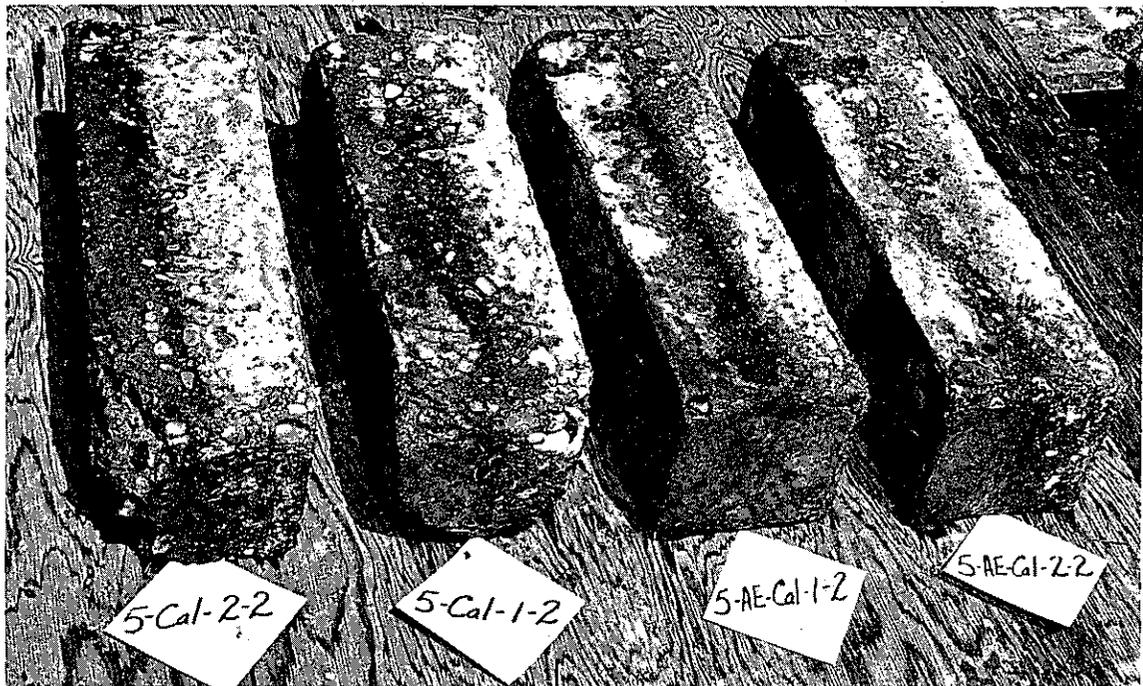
5-sack concrete after 30 months sulfate exposure. All four beams are from Type II cement. The beams on the left are nonair-entrained, and the beams on the right are air-entrained.
